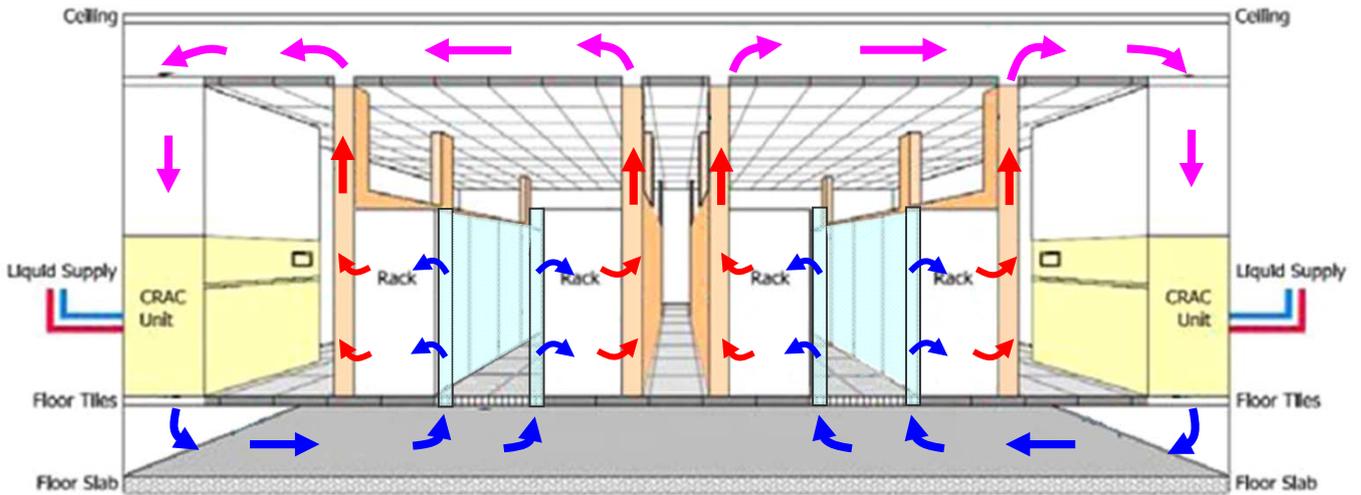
Raised floor implementation using inlet and outlet plenums / ducts integral to the rack.
